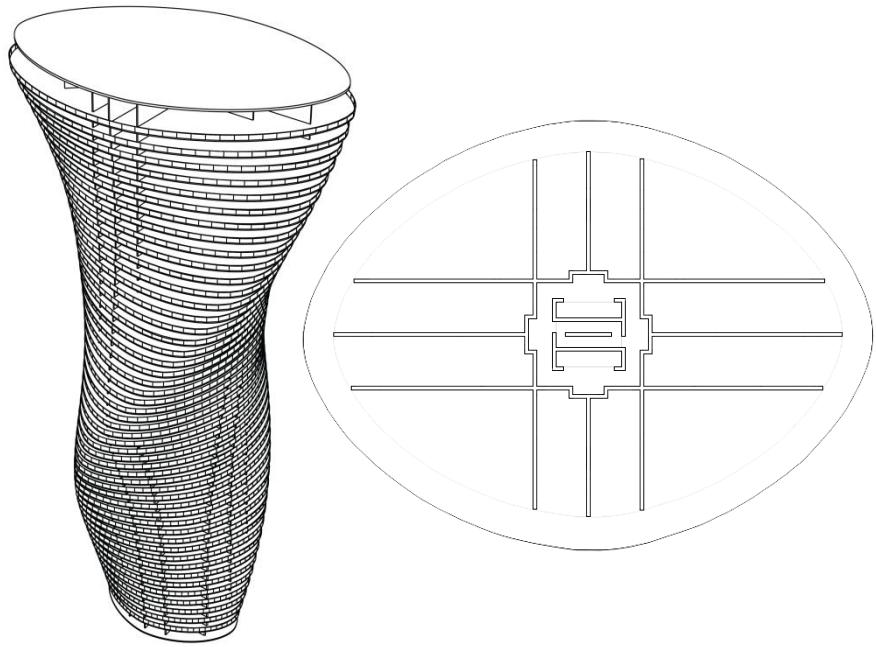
Model and plan of the tower with an increasing floor scale.
